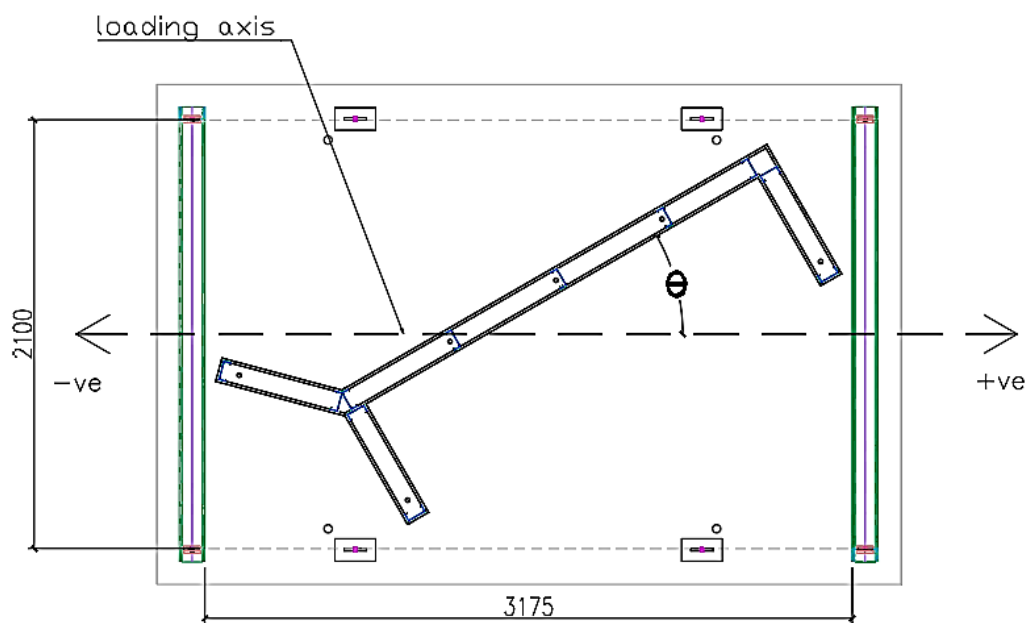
Individual test bed plan with dimensions of available space showing typical specimen and orientation to direction of loading (dimensions in mm).(Winstone Wallboards 2014)
